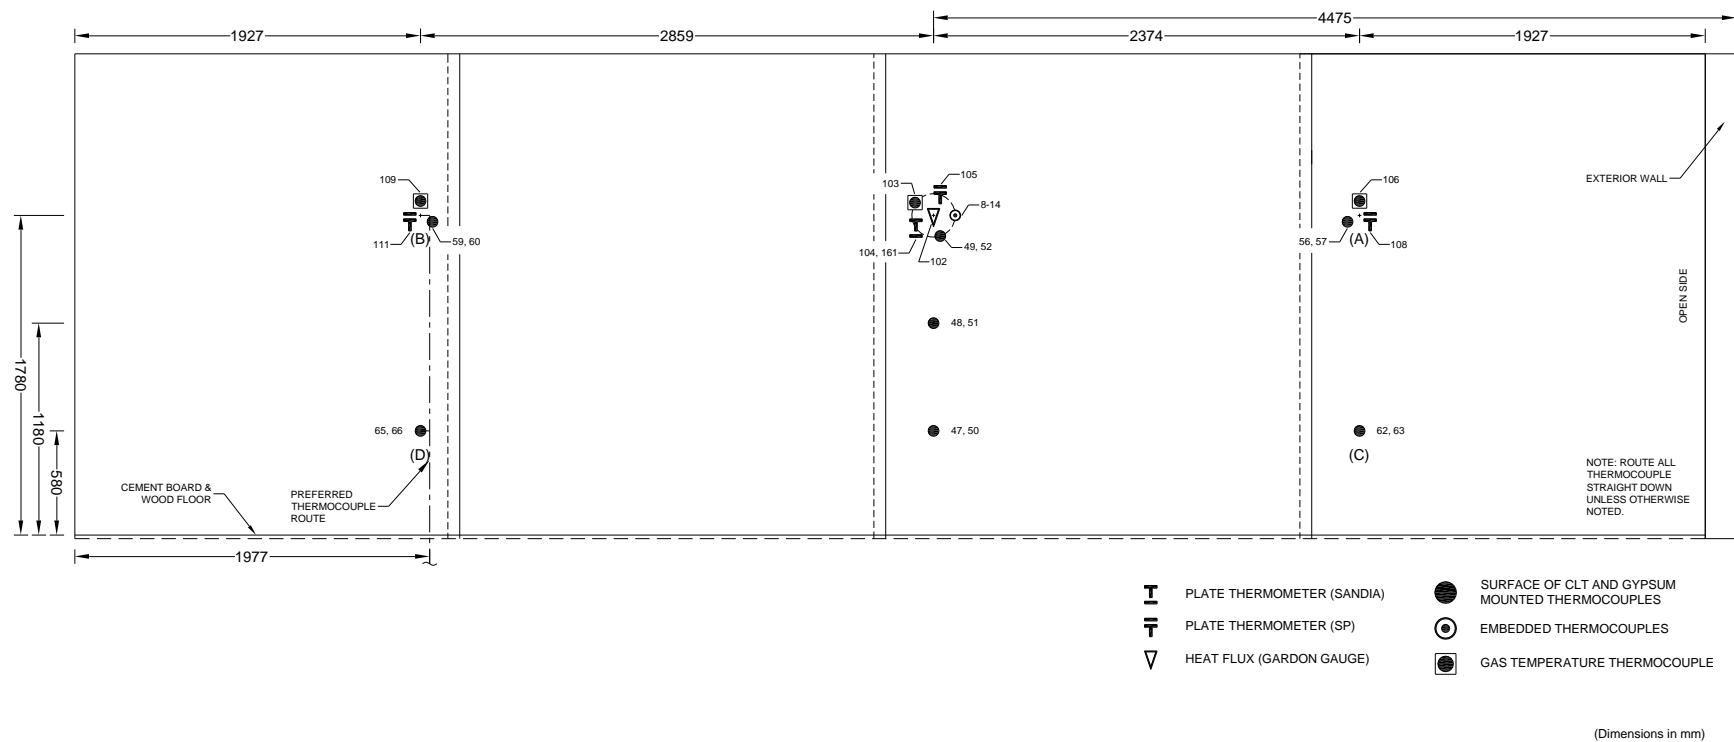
Test 1-2 Large Compartment CLT - W1 - Instrumentation Layout
